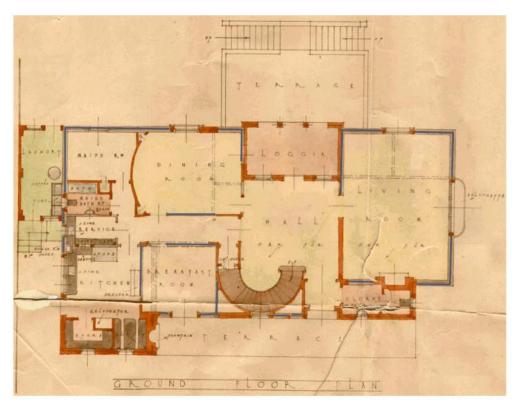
Ground floor plan of the Gilling Scheme, 1928. Note the grey walls indicating existing fabric retained from the Stanfield scheme.
